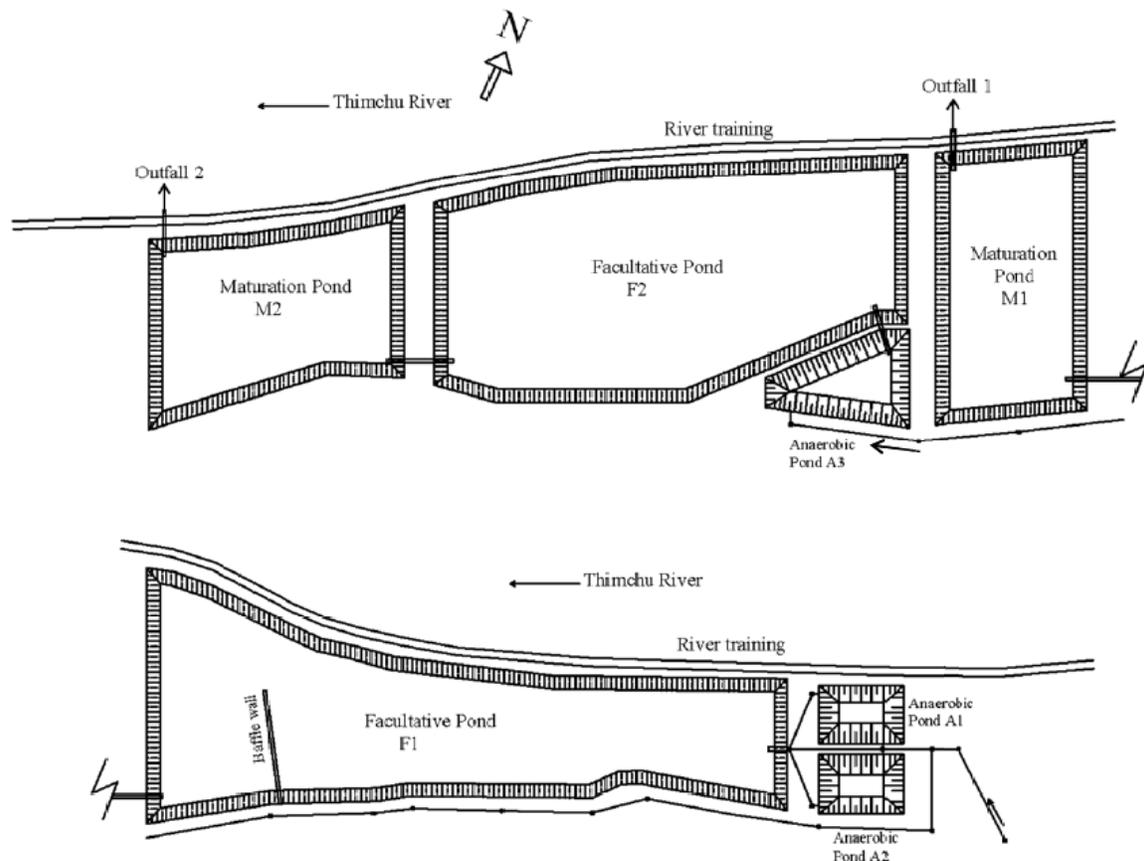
Schematic lay out plan of Thimphu waste stabilization ponds
